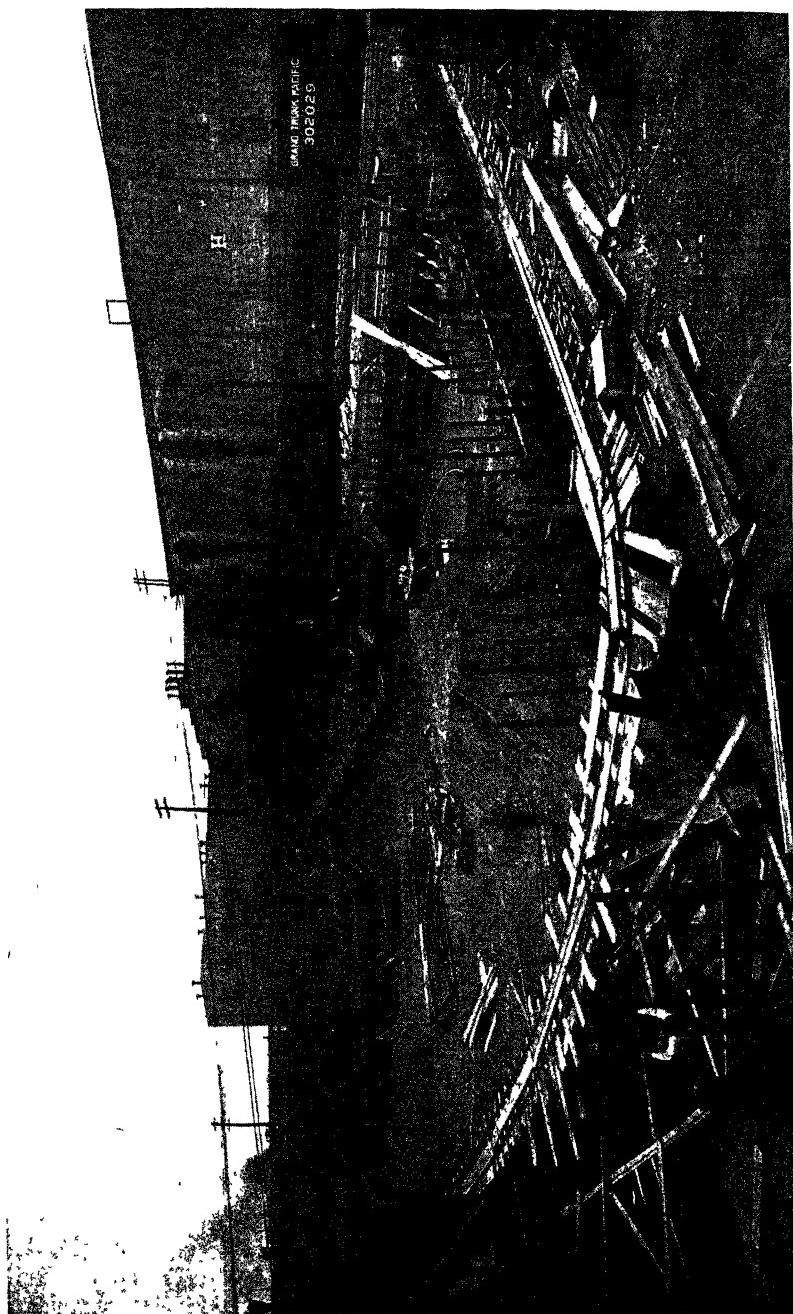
View of Excavation and Foundation Work for Power House Note Train Track Completely Surrounding the Work
